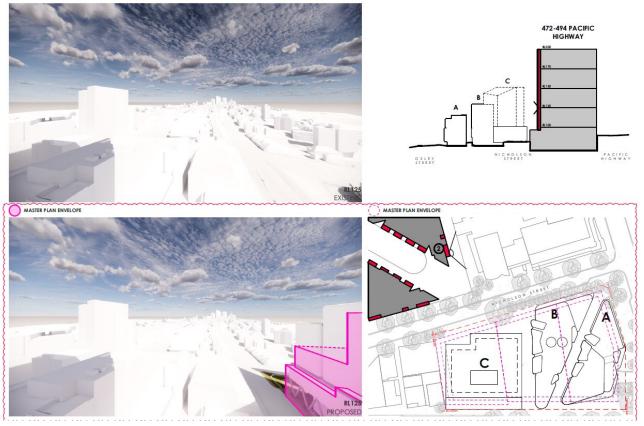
View analysis demonstrating extent of views retained by proposed height of Building C
